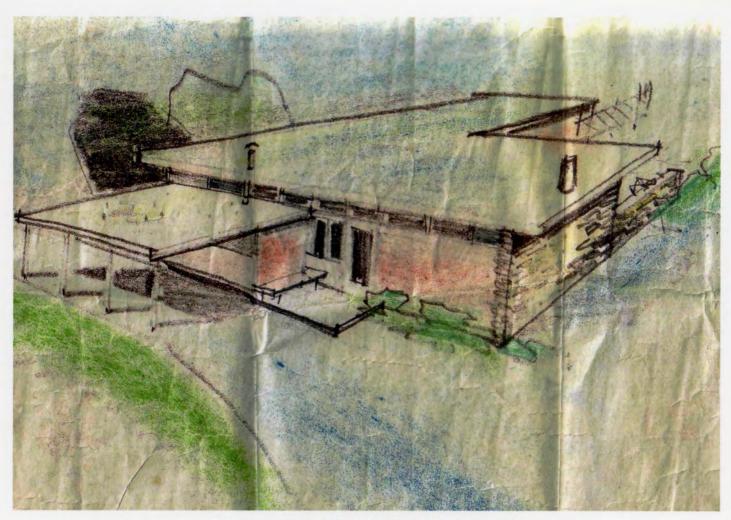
Elevation for 25 Split Rock Road, Sidney Katz, 1949.
